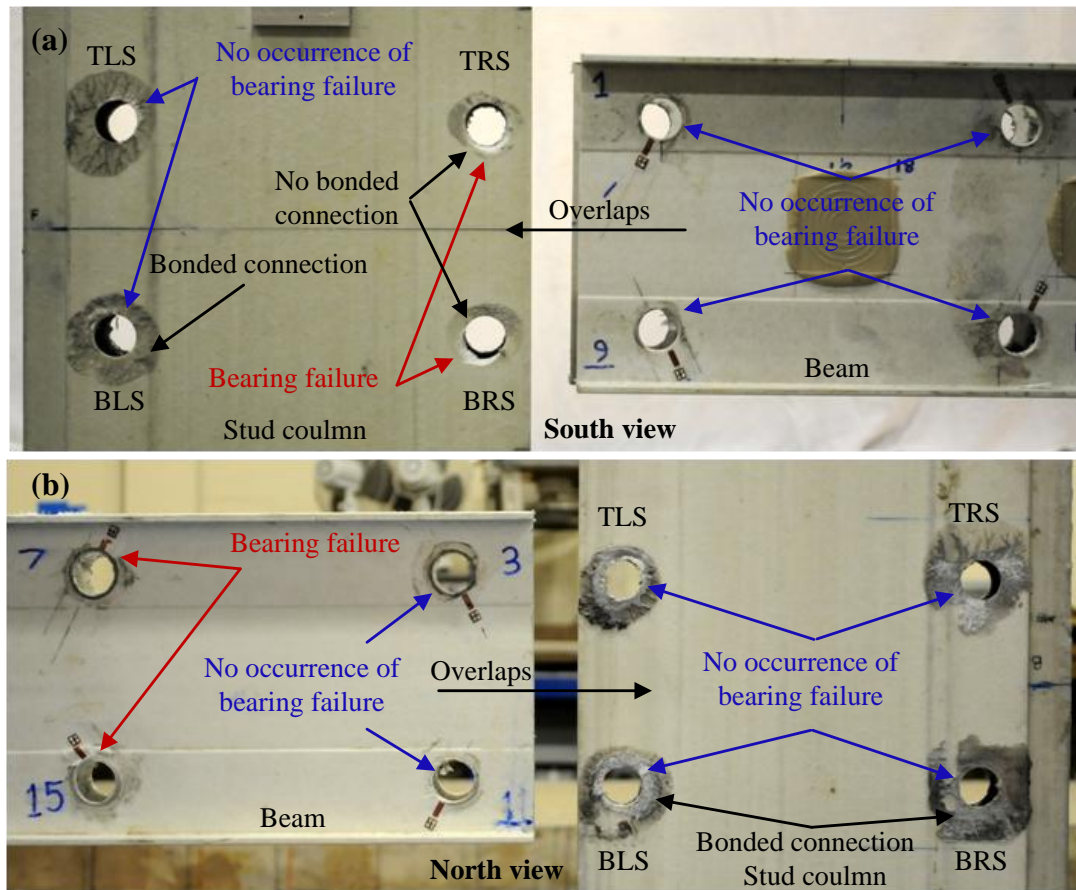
SAJ-4 debonding and bearing failures: (a) South view; (b) North view
